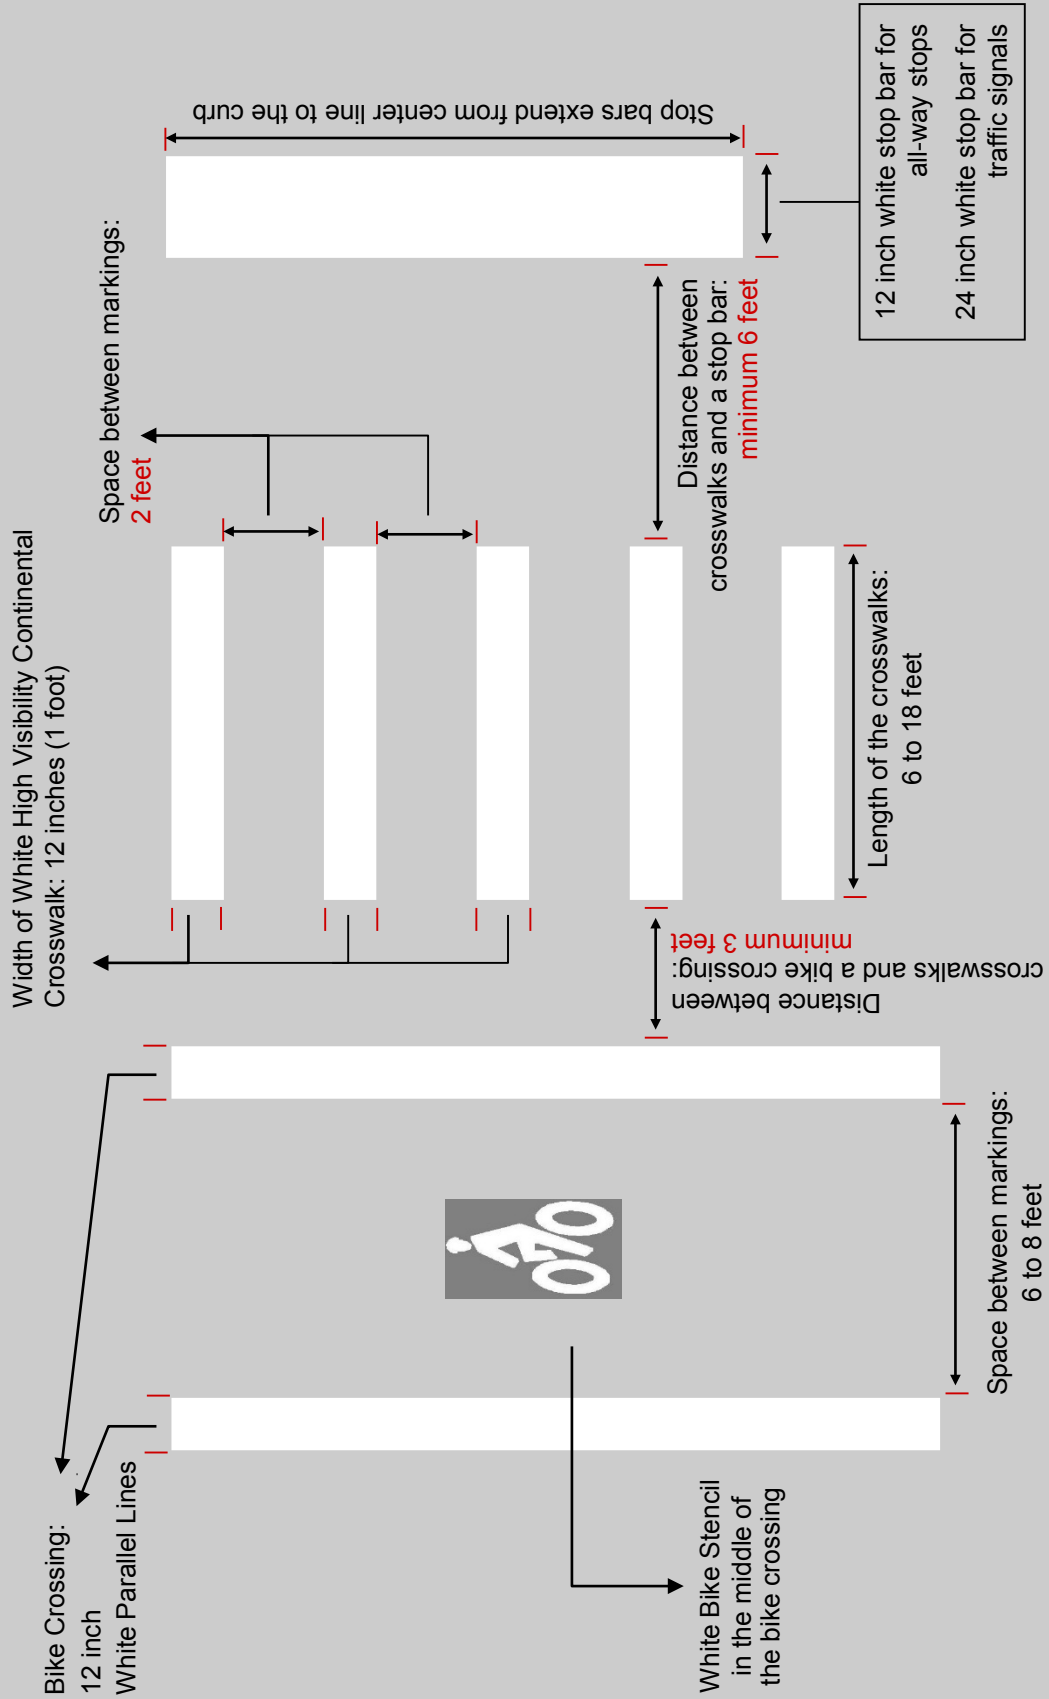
Bike Crossing, Crosswalk, and Stop Bar Layout
